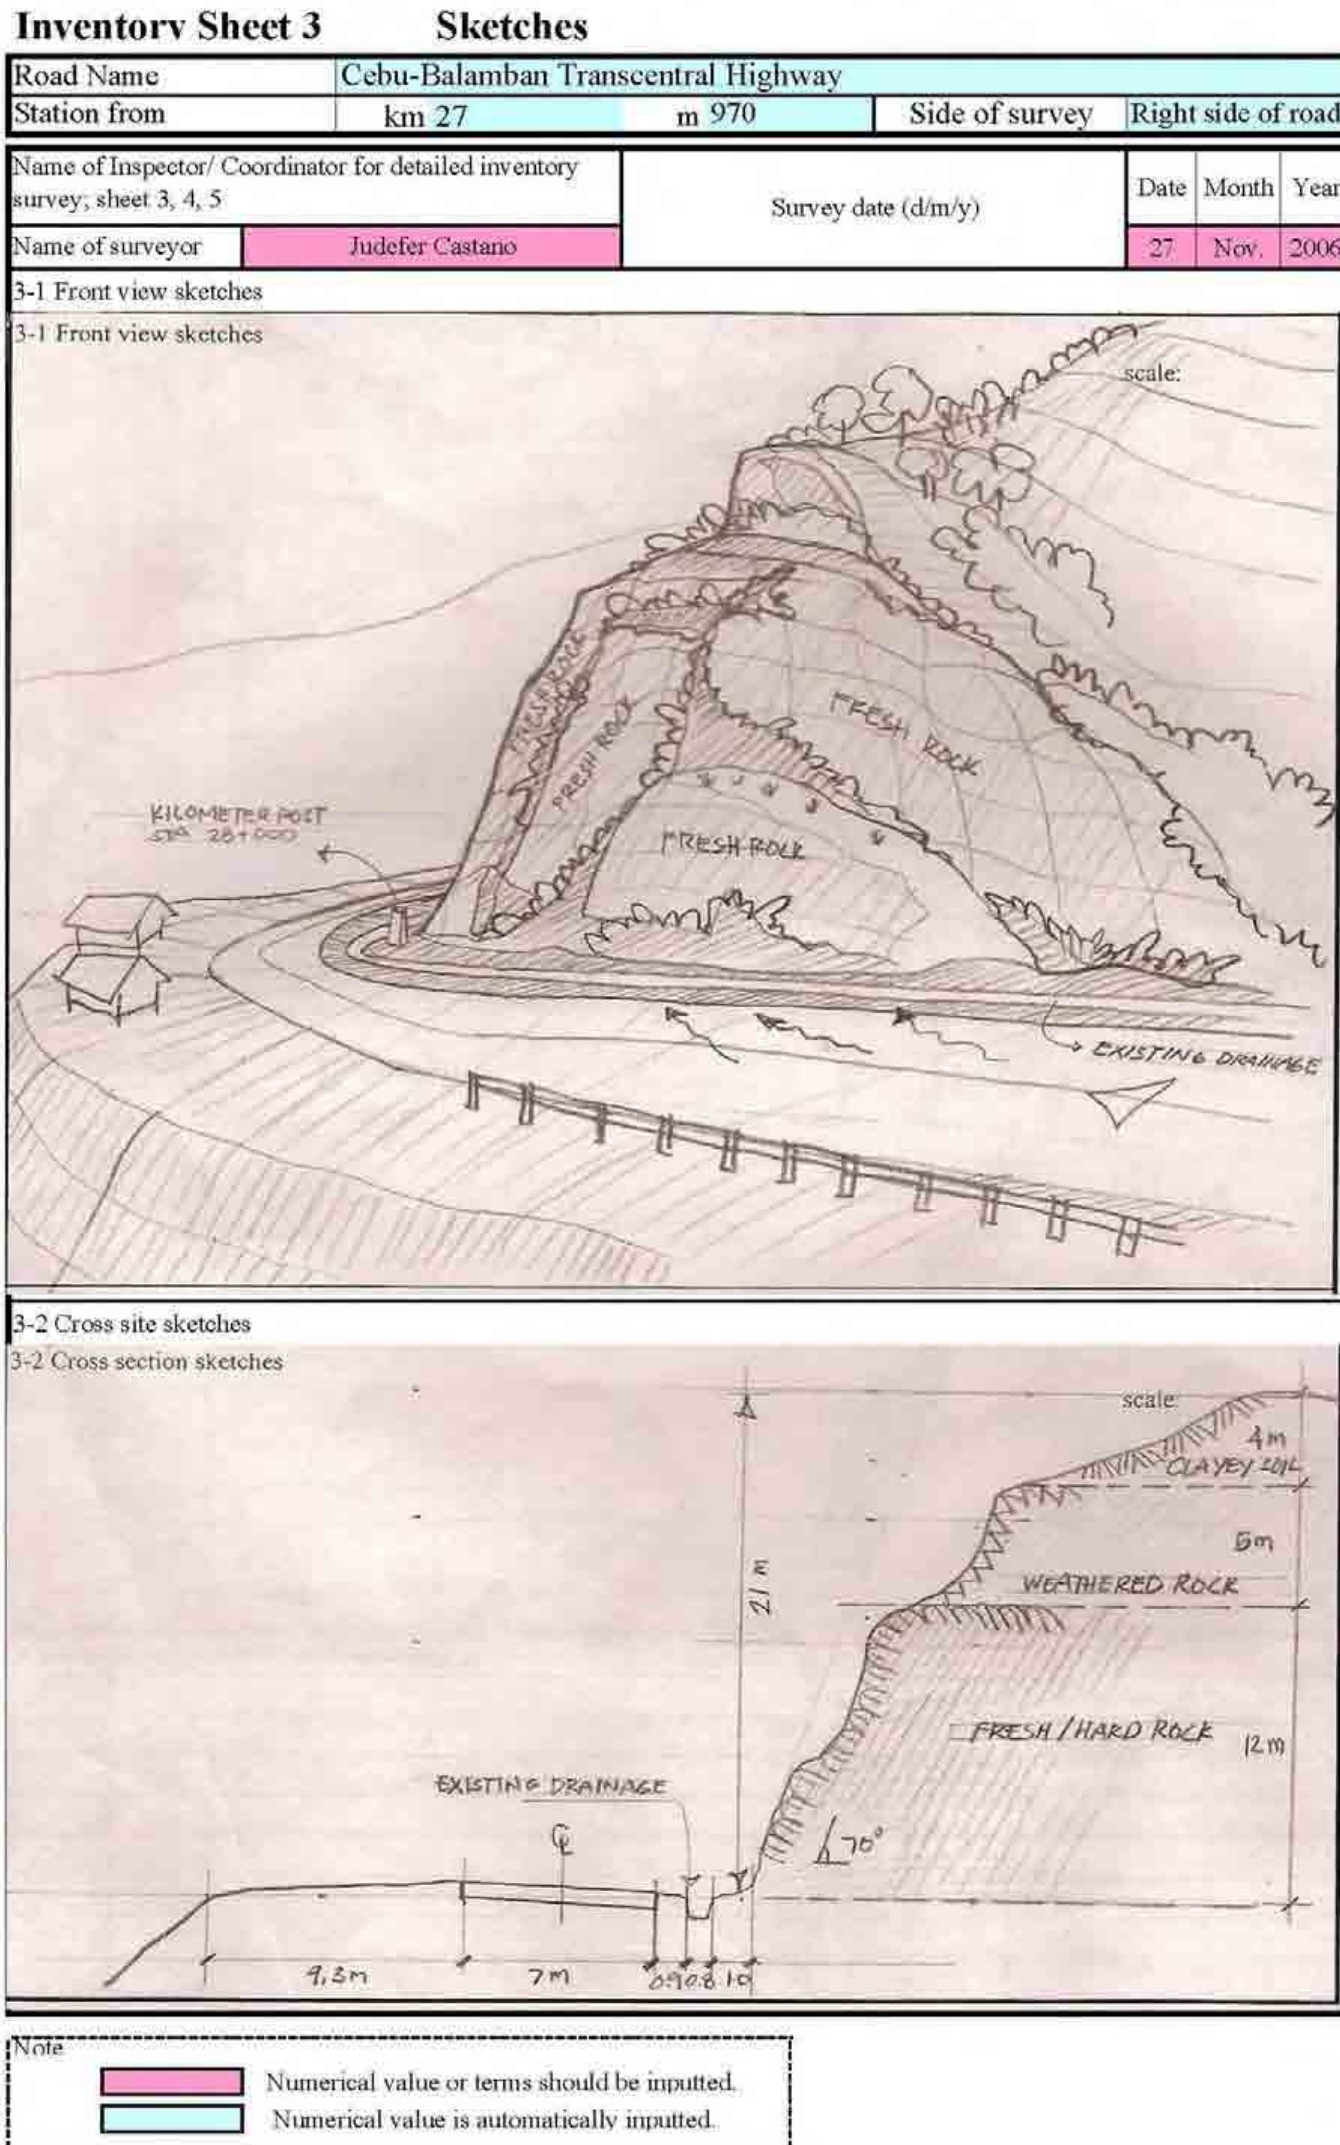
Example of Inventory Sheet 3: Sketches for Rock Slope Collapse
